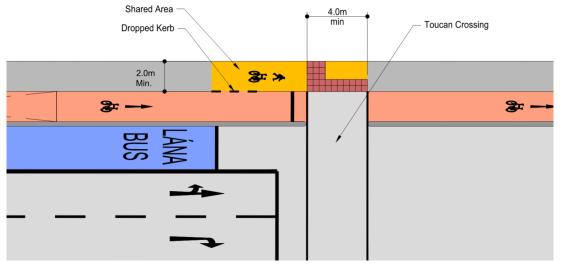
Alternative Cyclist Waiting Area Detail at Toucan crossing
